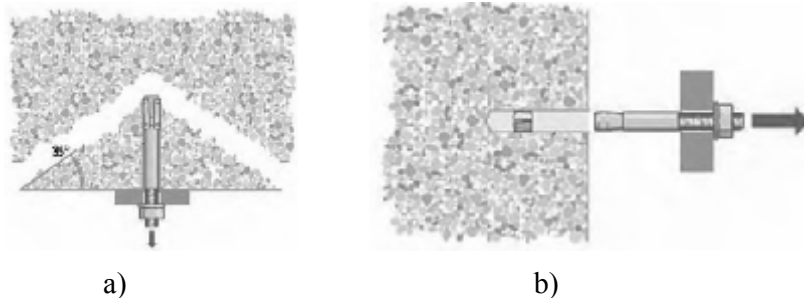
Failure modes: a) concrete cone breakout; b) pull-through.
